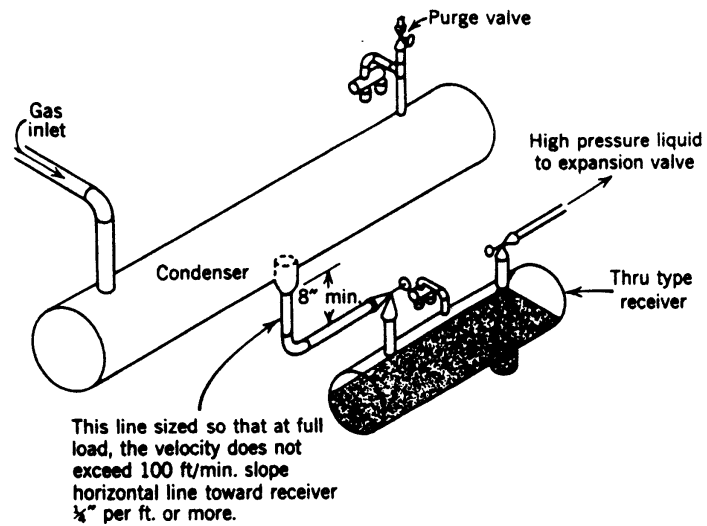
Top inlet through-type receiver hookup. (Courtesy of York Corporation.)
